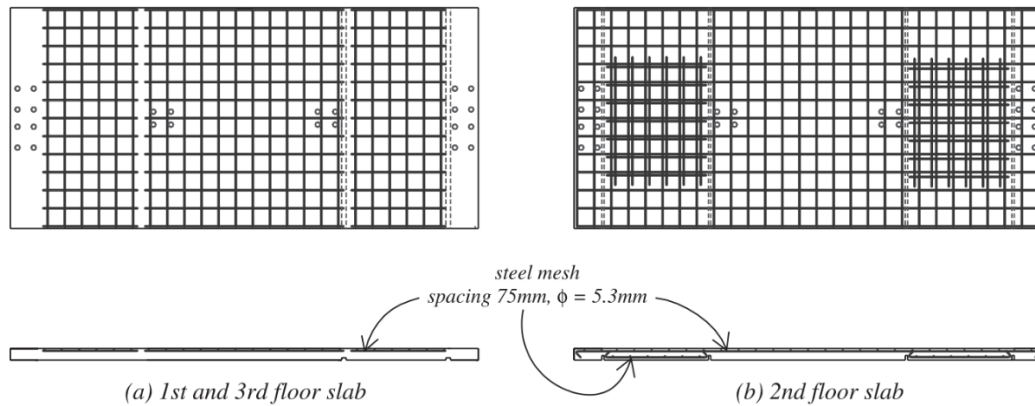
Reinforcement mesh of the slab with shallow grooves (1st and 3rd floor) and the deeper groover (2nd-floor slab) (Toranzo et al. 2009).
